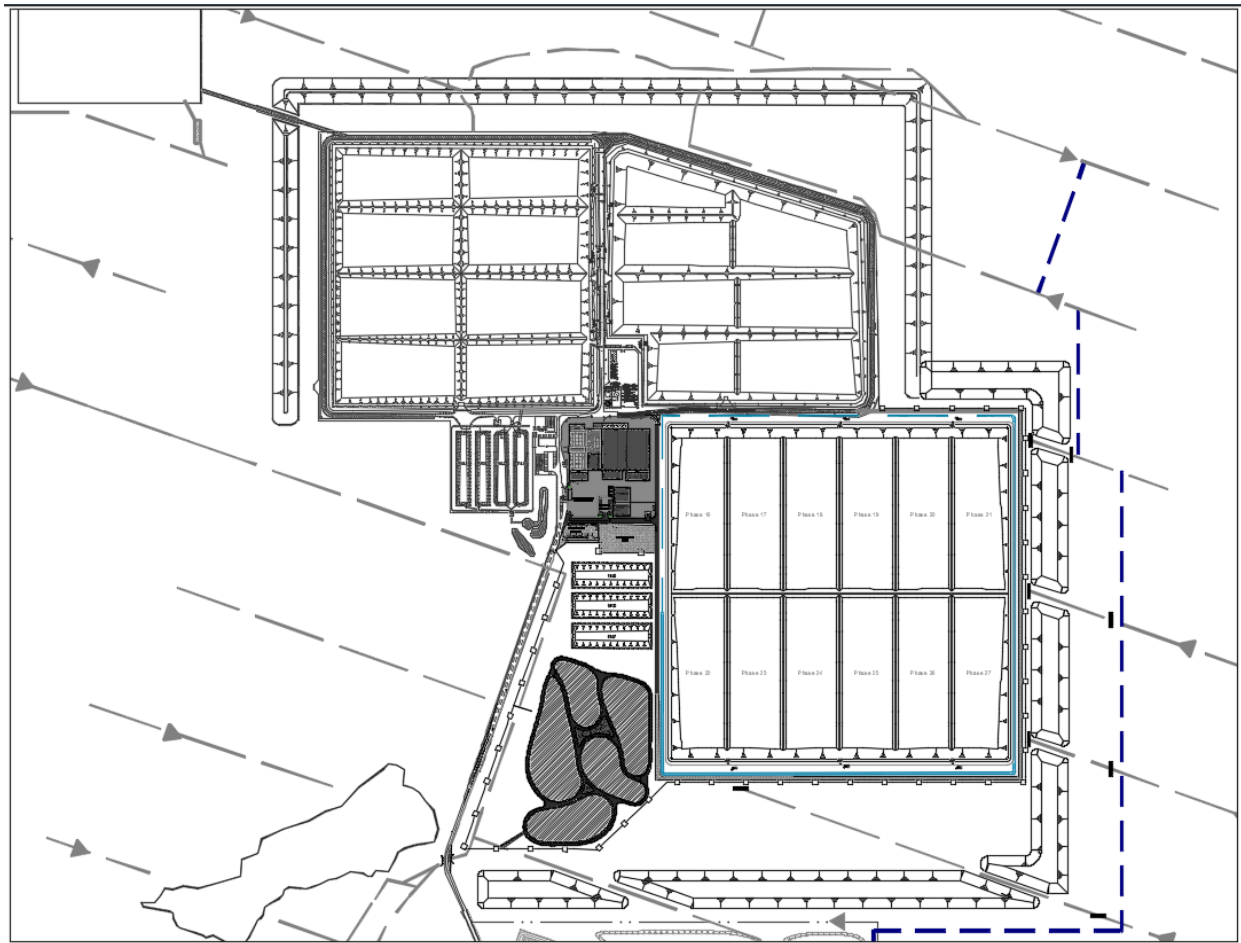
BnM Drehid WMF Expansion: Preliminary site layout and facility footprint
